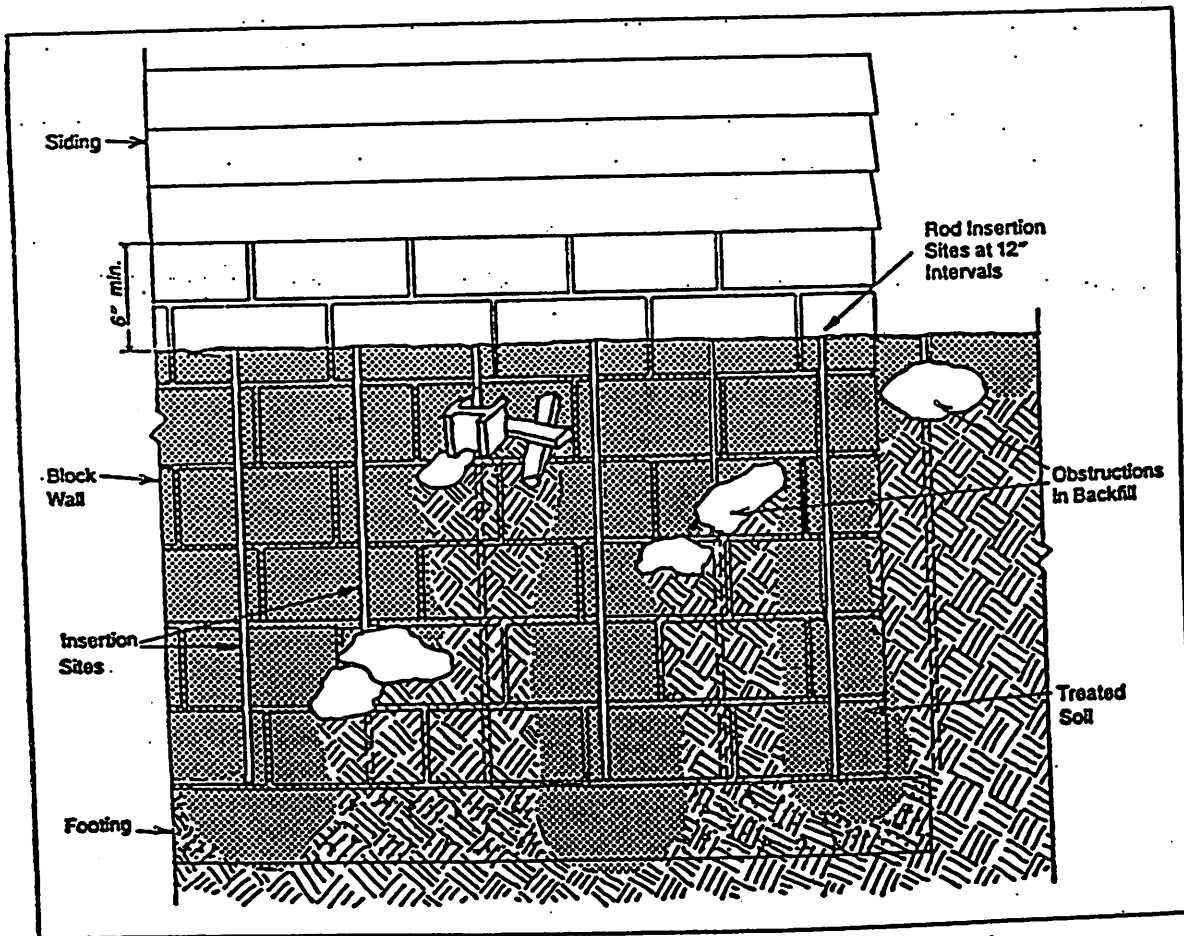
Obstructions in backfill prevent complete treatment of soil to the footing.
